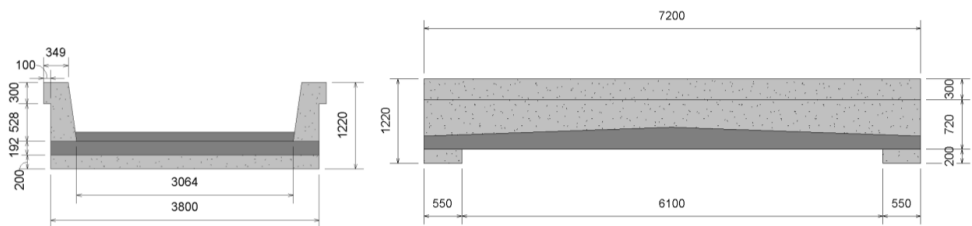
Trough bridge drawings: frontal elevation (left) and lateral elevation (right).
